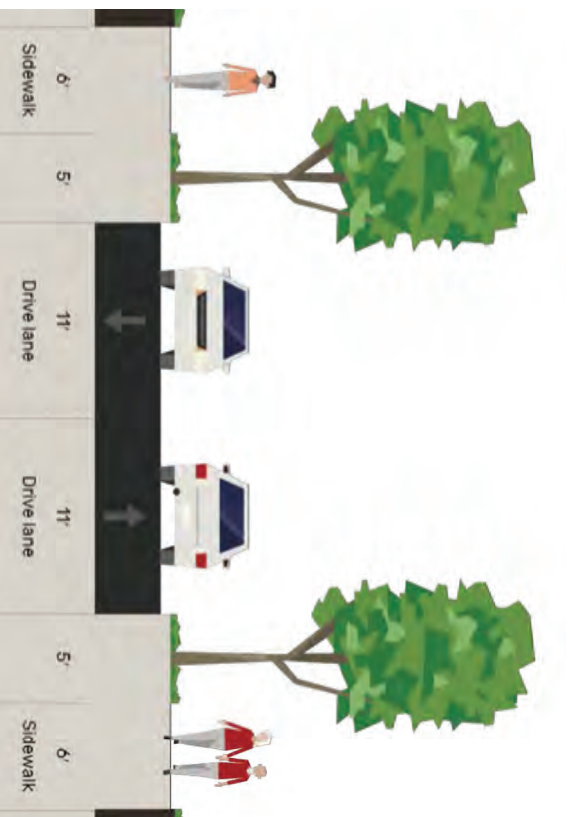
A: PROPOSED LOCAL STREET WITH CURB – MIXED USE STREET CROSS-SECTION (SOURCE: STREETMIX)
